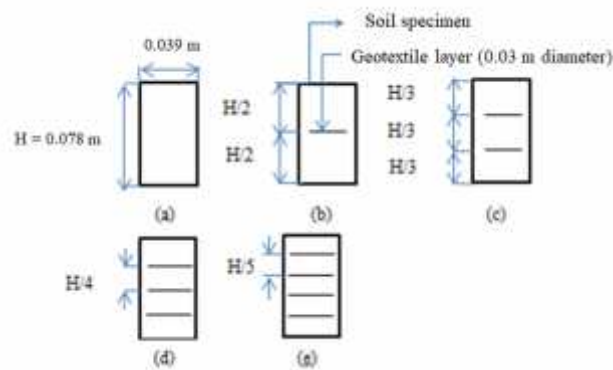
Arrangement of geotextiles in reinforced soil (a) Plane soil (b) soil with one-layer geotextile (c) soil with two-layer geotextile (d) soil with three-layer geotextile (e) soil with four-layer geotextile
